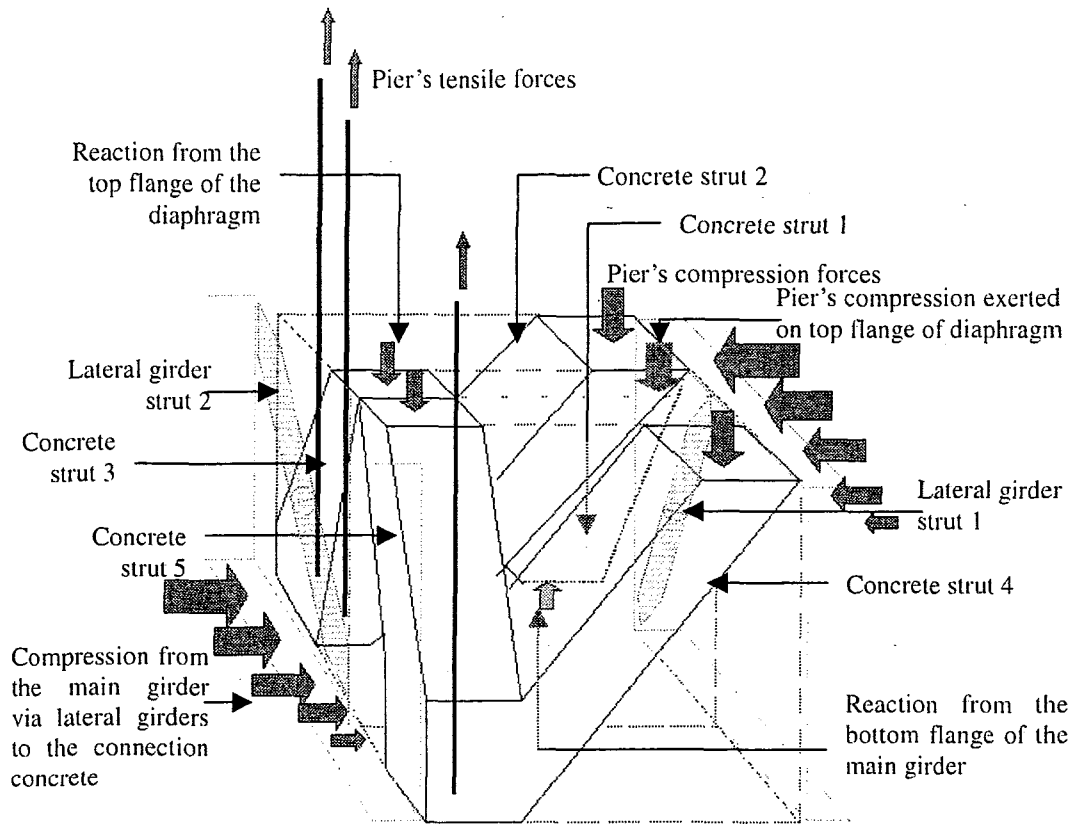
Force transfer mechanisms inside the connection concrete of specimen C-4.
